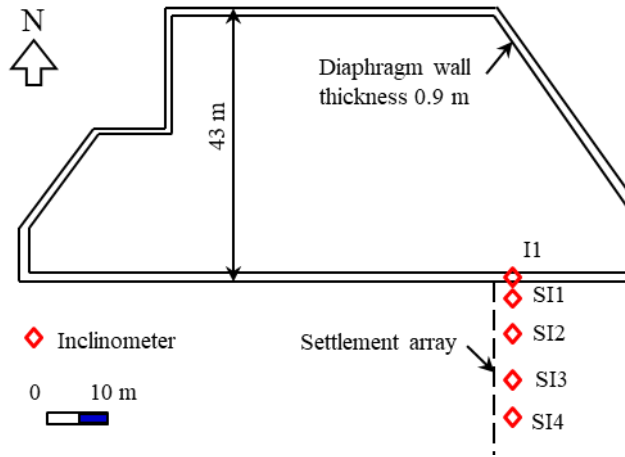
Instrumentation layout of the Taipei National Enterprise Center (TNEC) excavation
